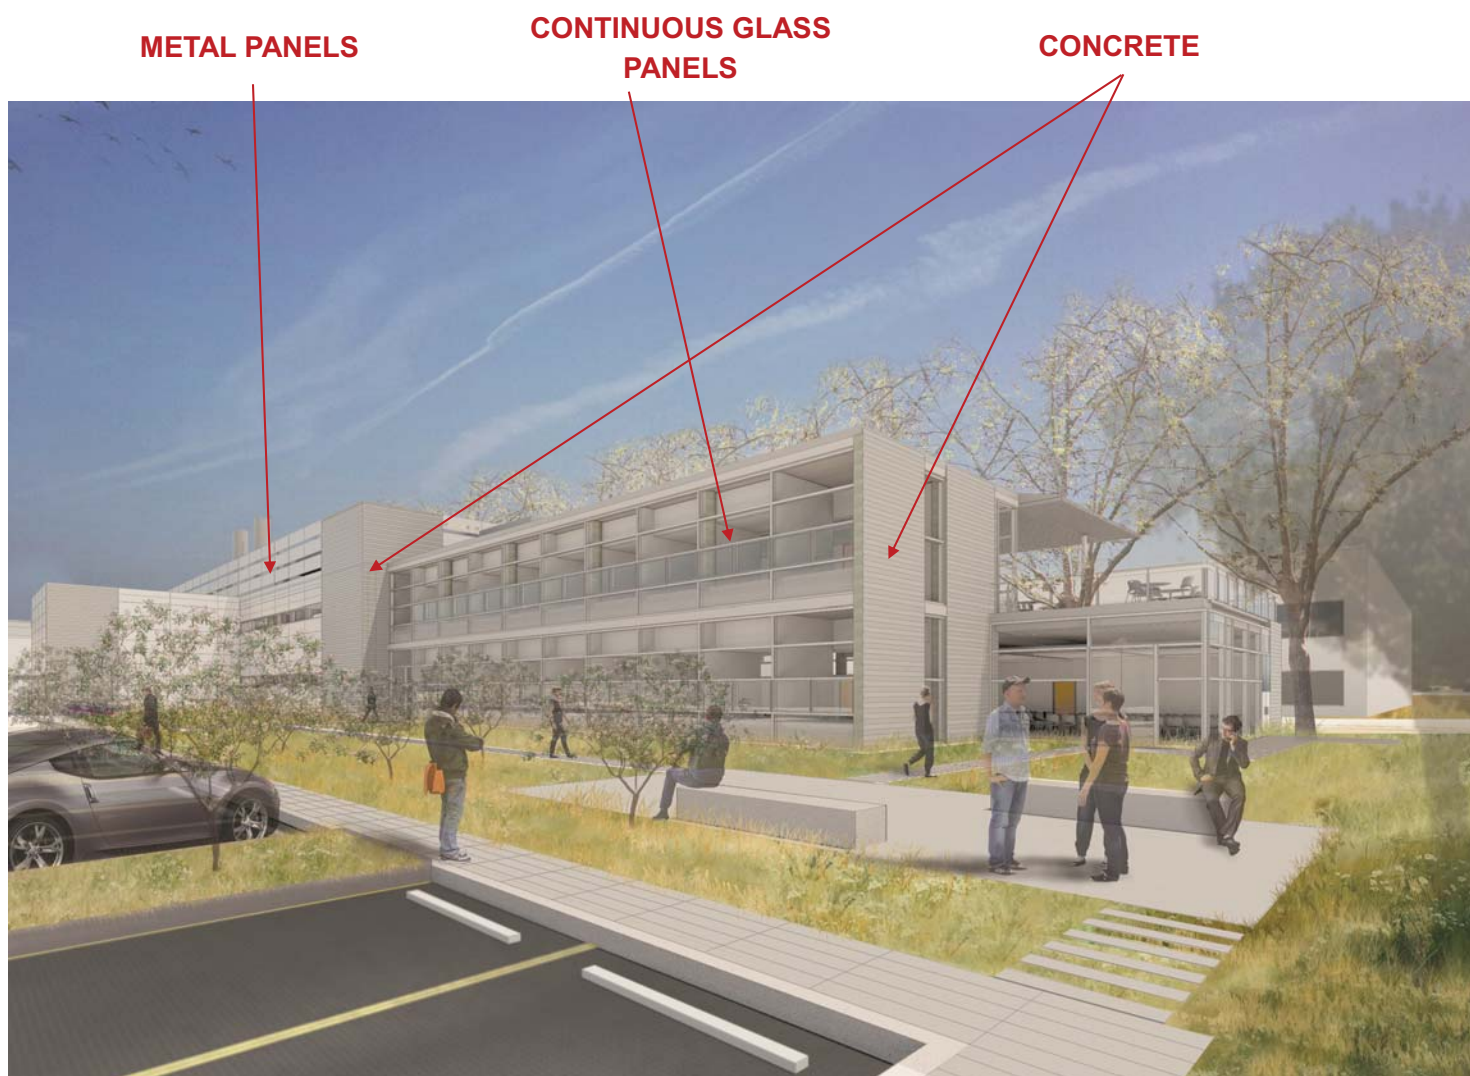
Proposed Building N288, northwest corner (view facing southeast, towards Building 220 pictured in background).
